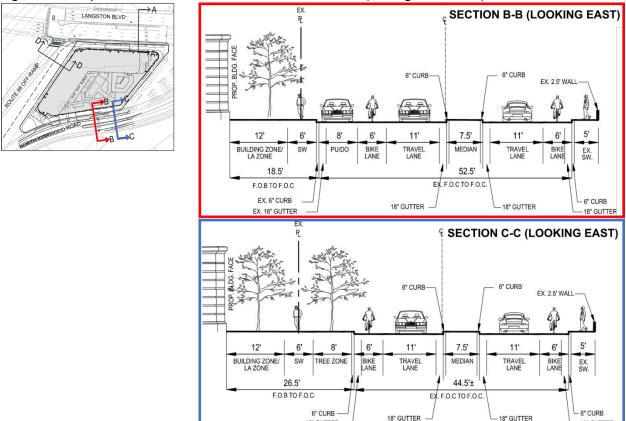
Proposed North Kirkwood Road Cross-Section (Facing Northeast)
